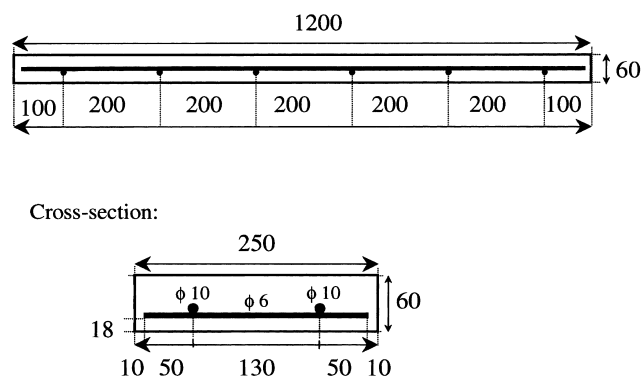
Geometry and dimensions (in millimeters) of the test sample and the position of the reinforcement bars.
